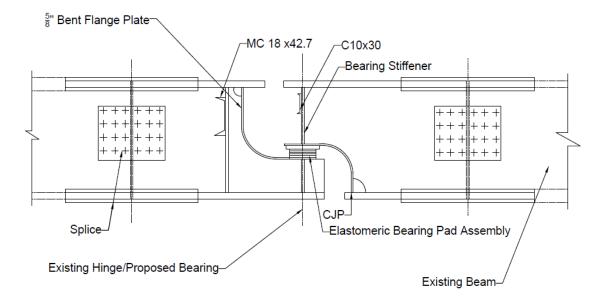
Ship lap joint detail (Mass DOT, 2014).
